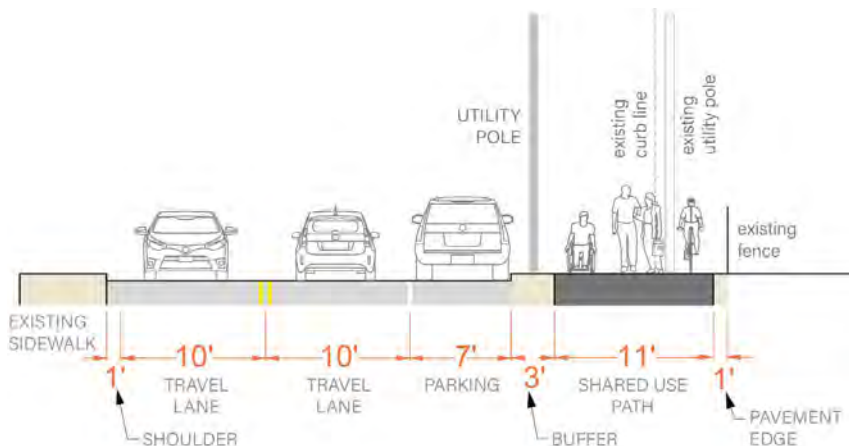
Segment A - Summer Street next to Buzzell Field and Arlington Catholic Field
